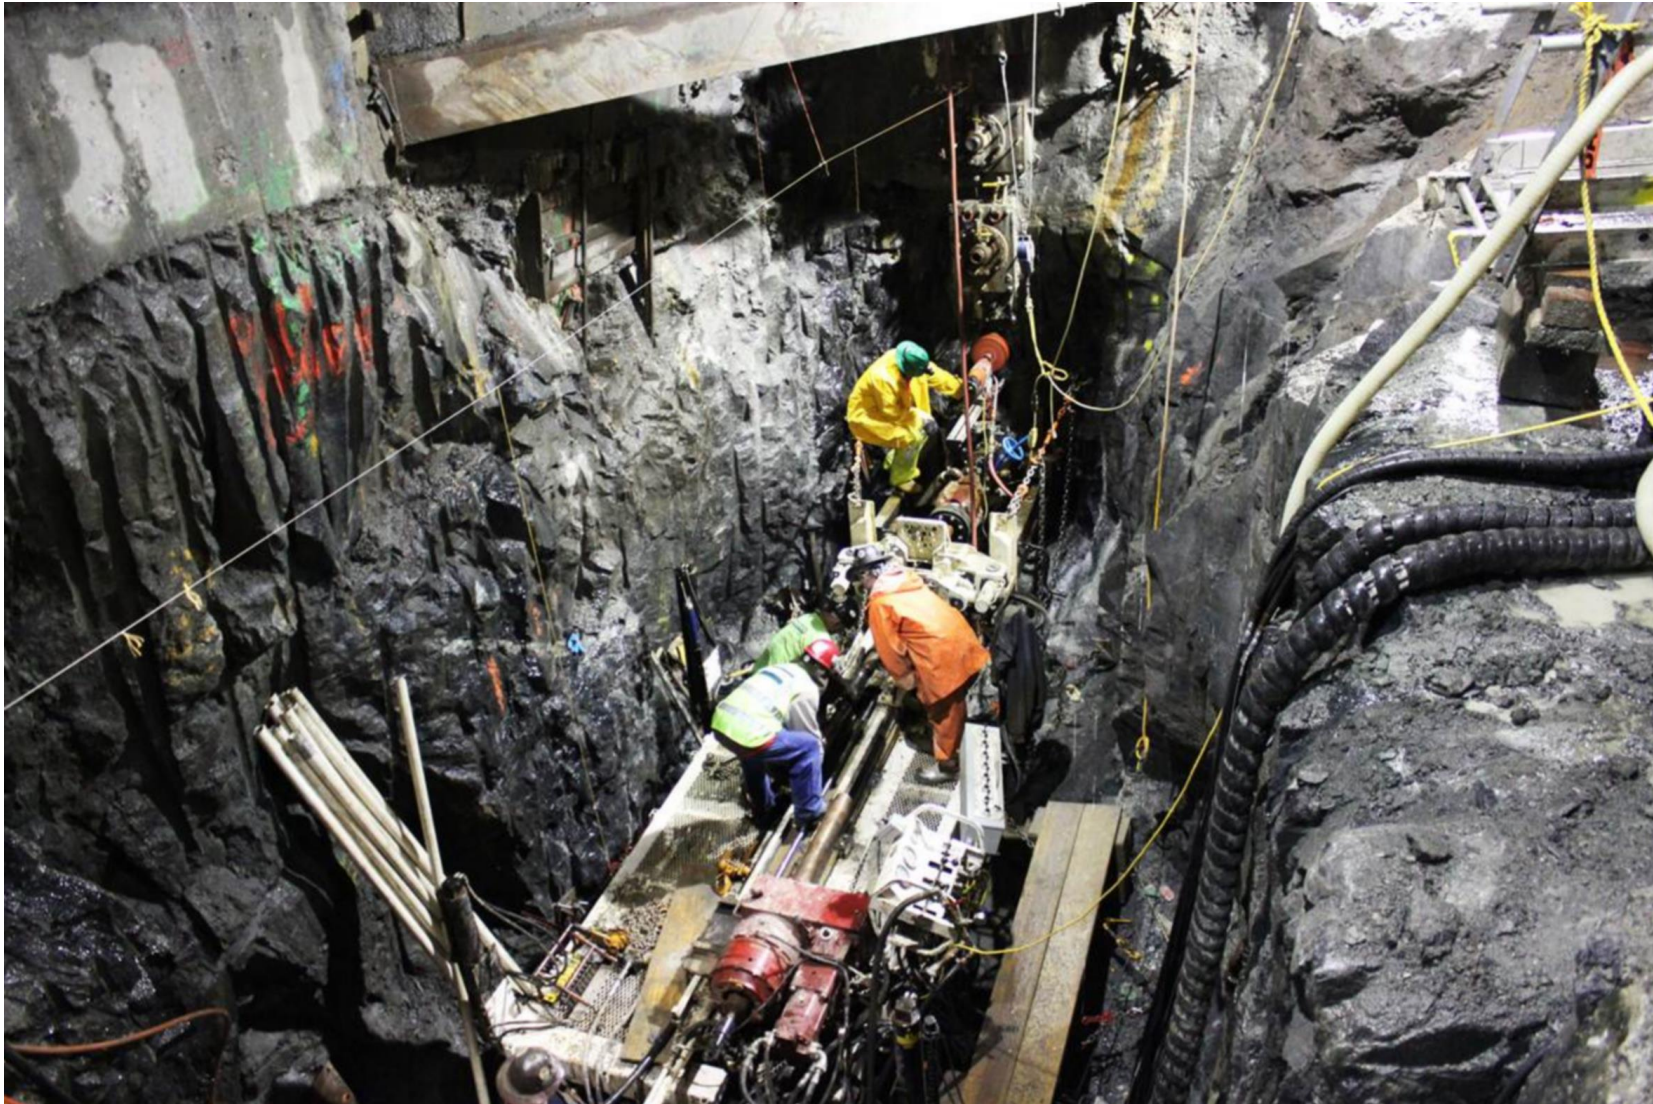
Rock pit excavated at the south side of the arch to permit drilling of the lowermost freeze pipes.
